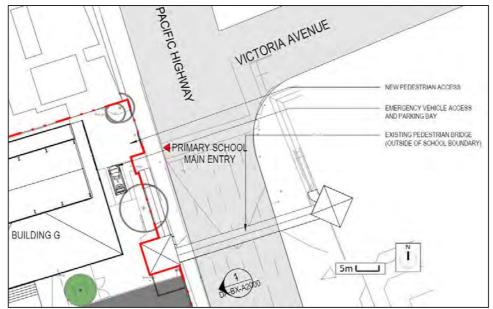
| CPS site plan showing location of loading spaces and (Source: RtS, October 2020)
